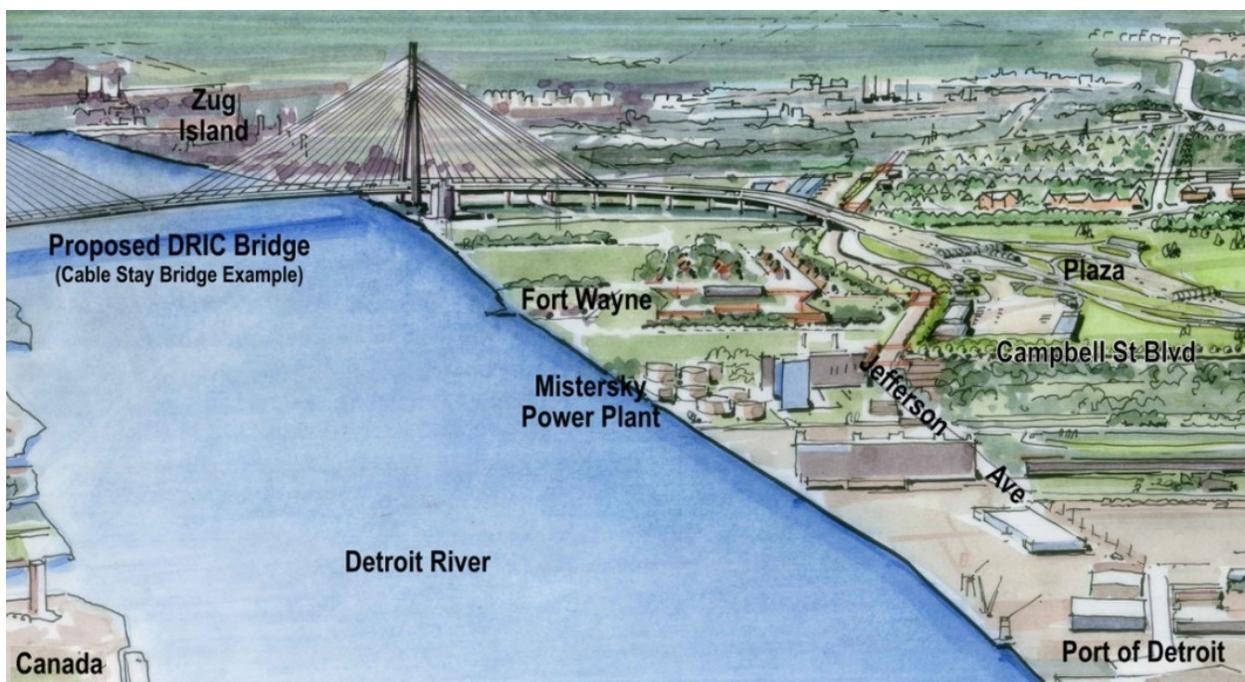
Conception of completed Gordie Howe International Bridge. Image: Windsor-Detroit Bridge Authority
